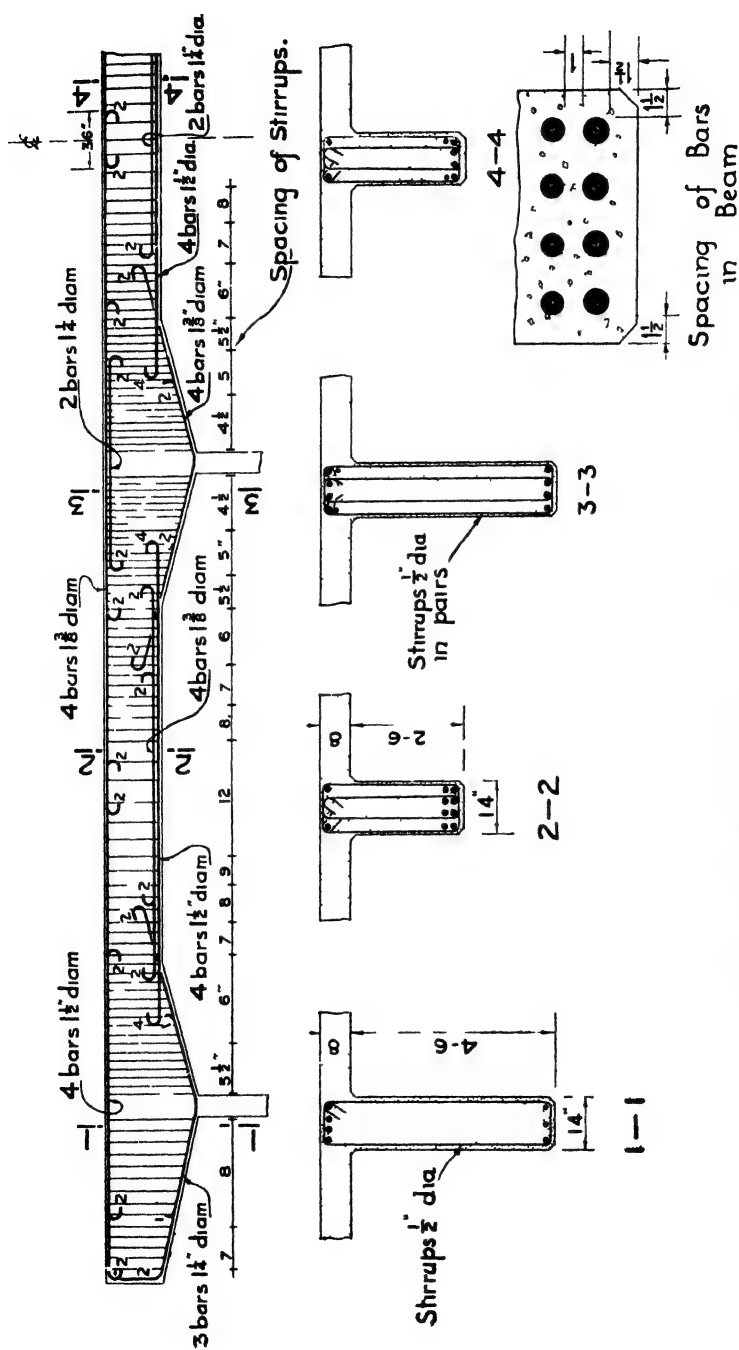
Arrangement of Reinforcement in Main Longitudinal Beams
